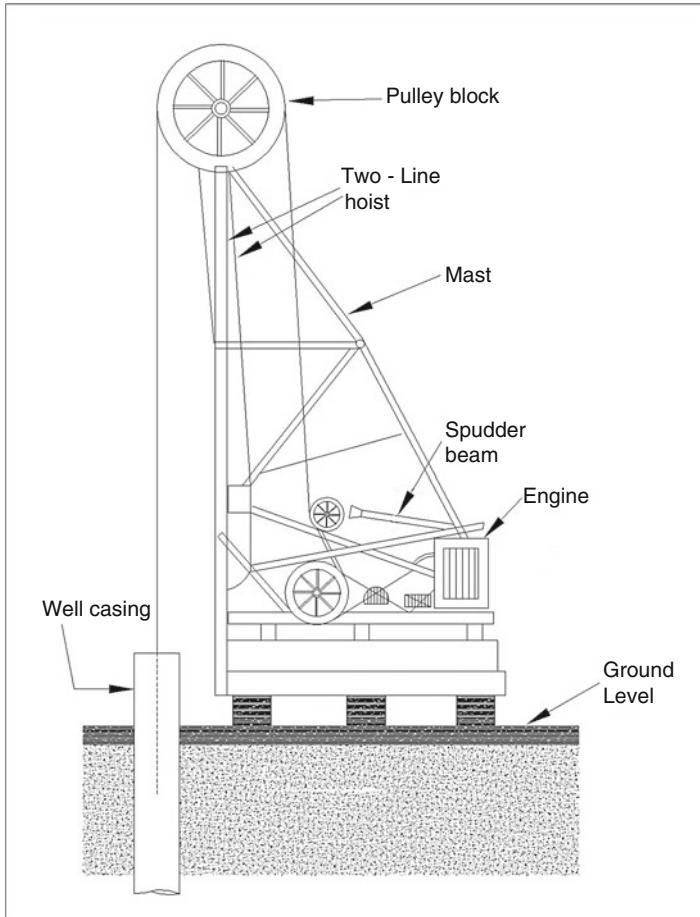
Schematic diagram showing the process of cable tool drilling. (CBPI 1978)
